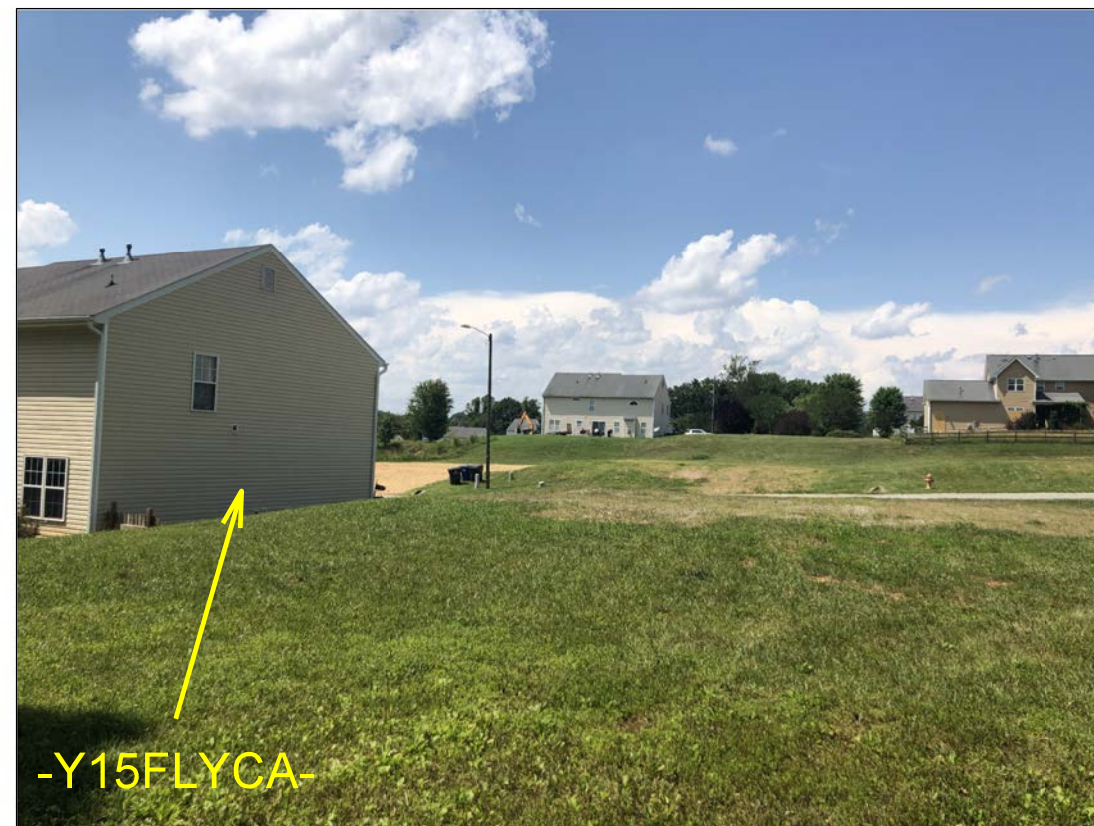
VIEW FROM END BENT 2, FACING UPSTATION.
